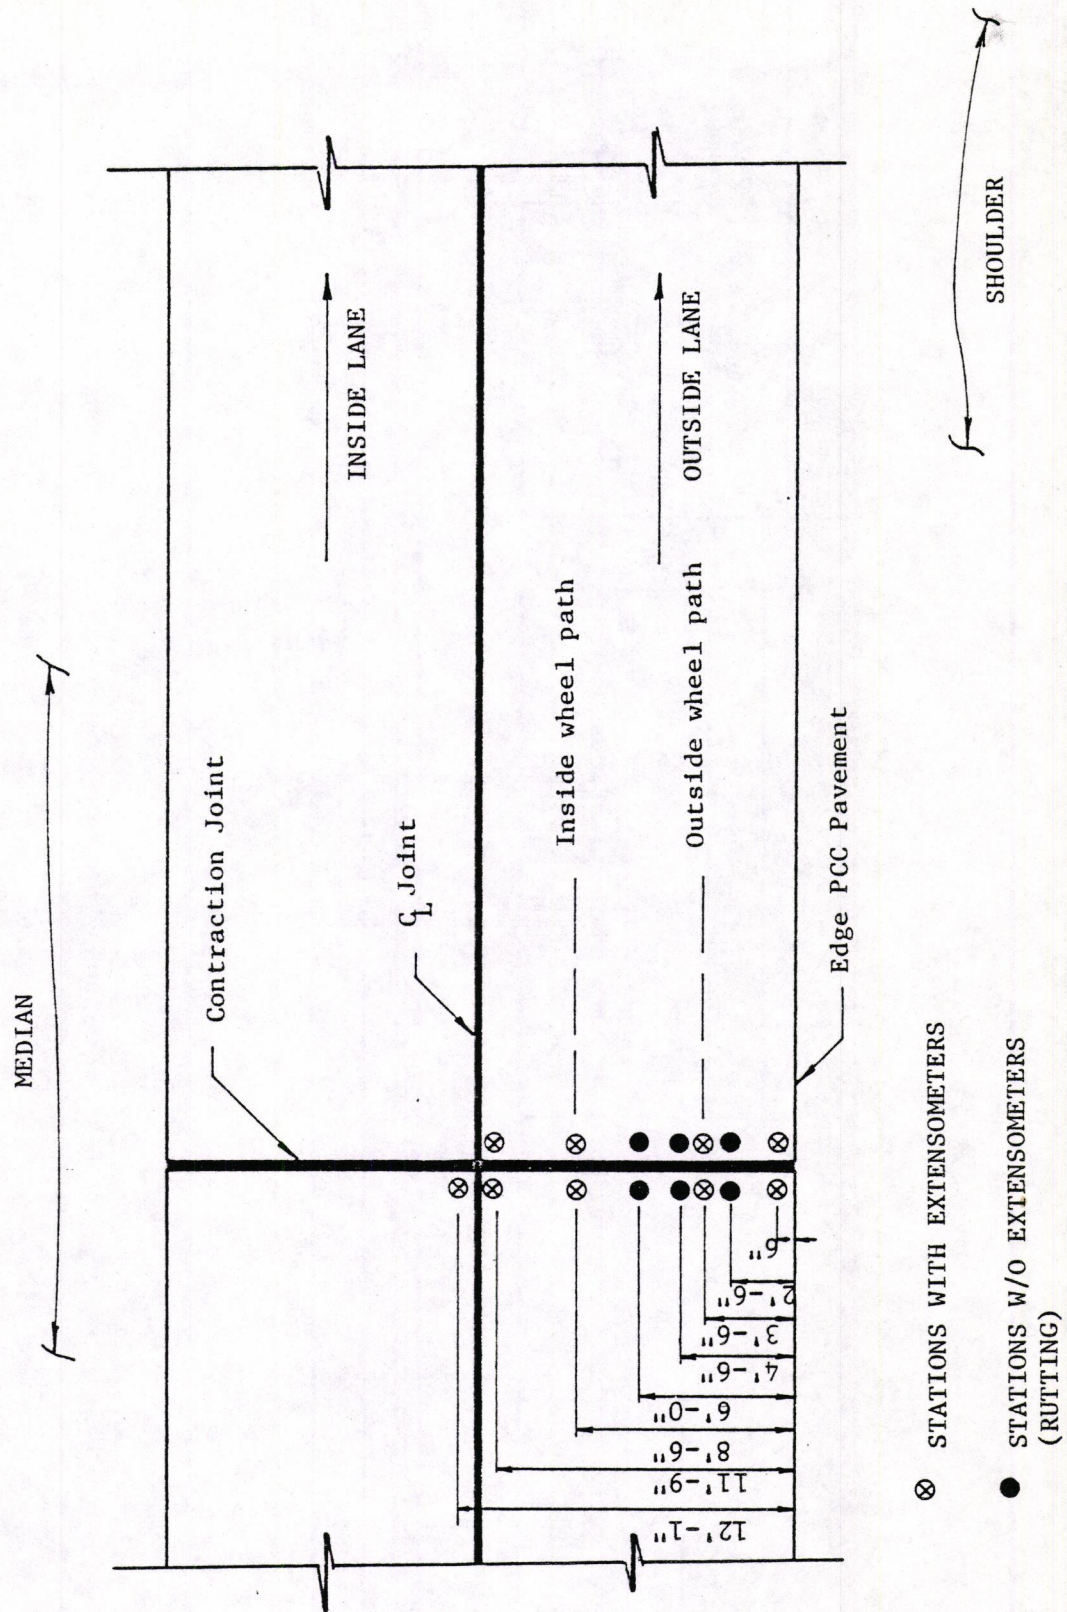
Typical Sensor edment Plan (after Ref. 16).
